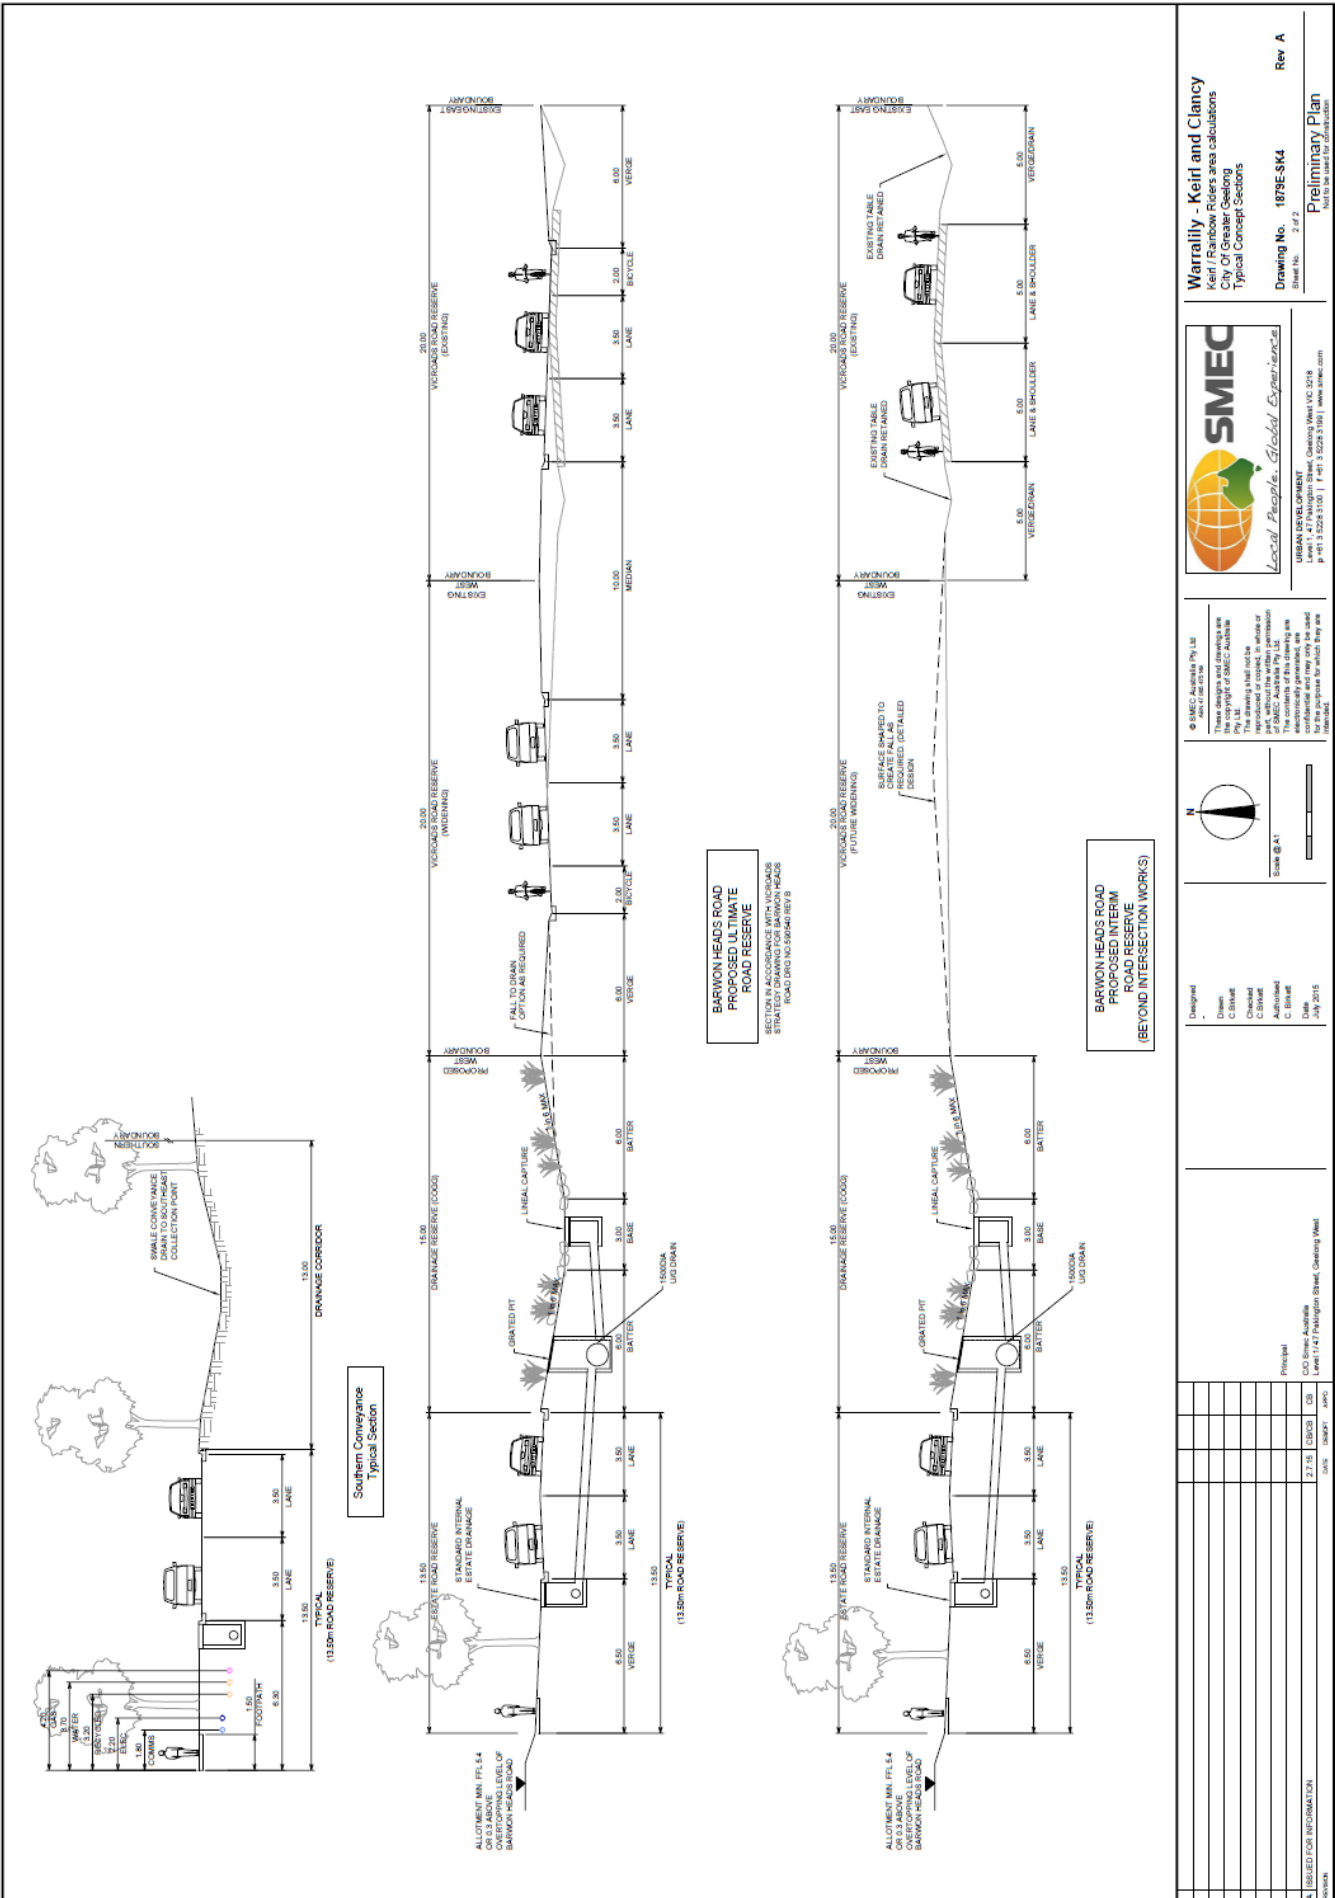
SMEC Developed Barwon Heads Road Cross Sections
